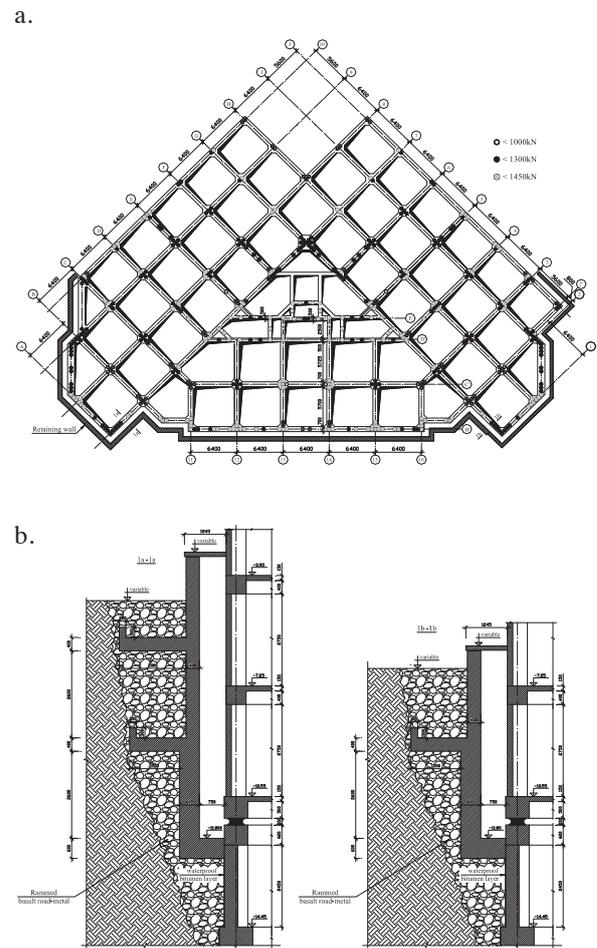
Plan of location of seismic isolation rubber bearings and the retaining wall, and distribution of vertical forces indicated by color-coded rubber bearings (a) ; vertical elevations of the retaining wall (b)
